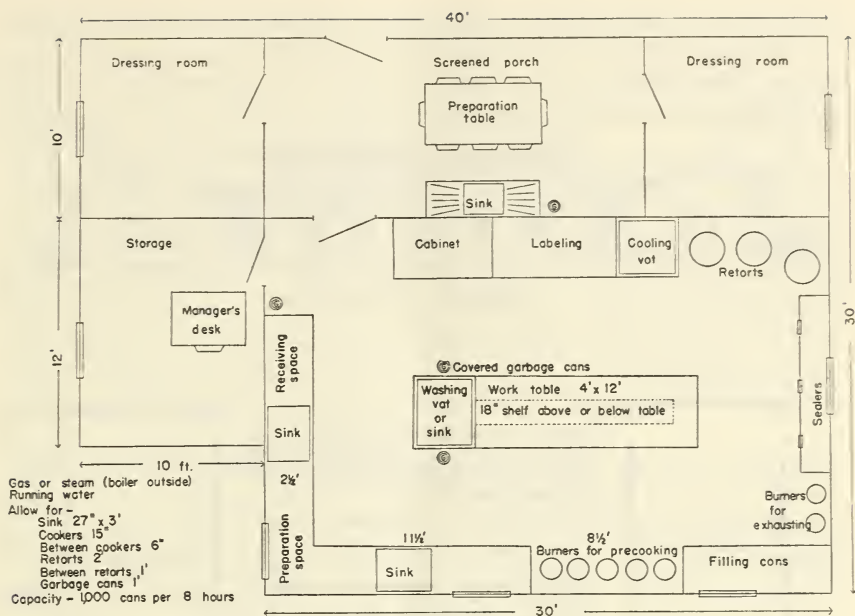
Suggested floor plan for canning center, 30 feet by 40 feet (Extension Service, College Station, Tex.).
